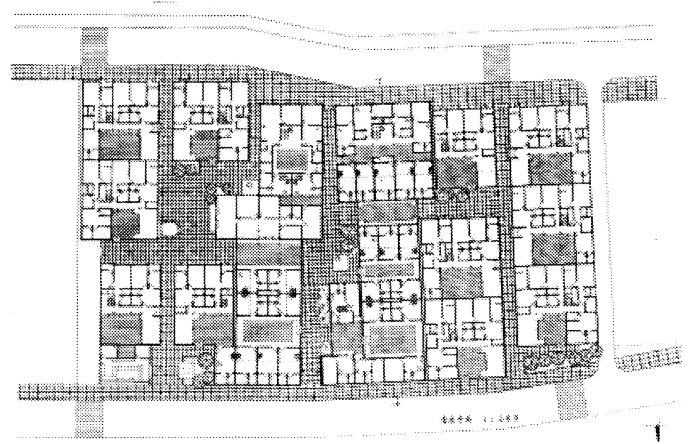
Site/floor plan of part of the renewed neighborhood.
